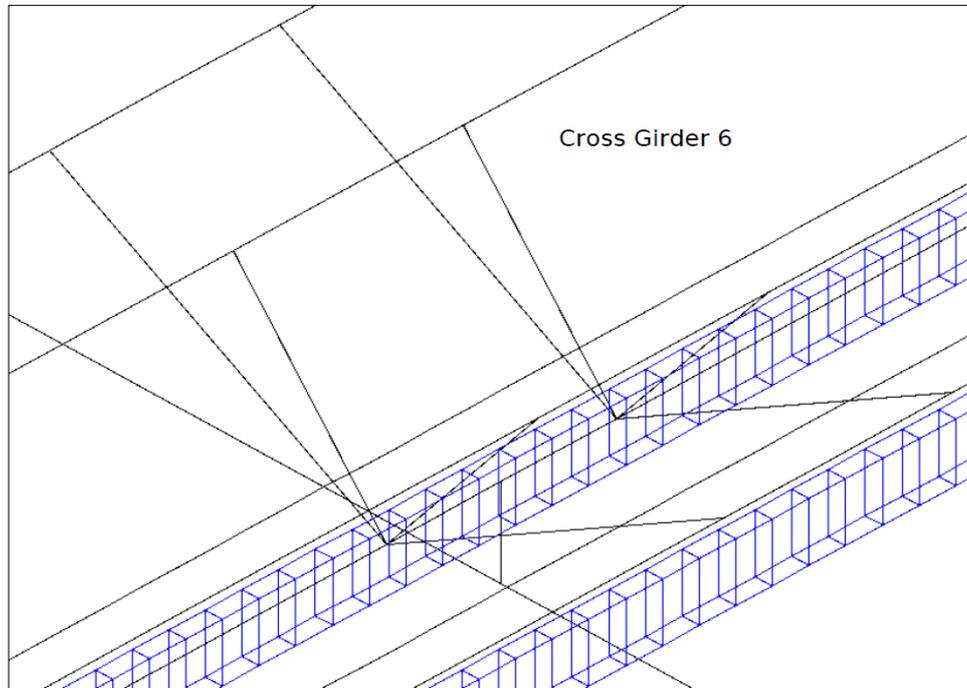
Isometric view of the railway girder across cross girder 6.
